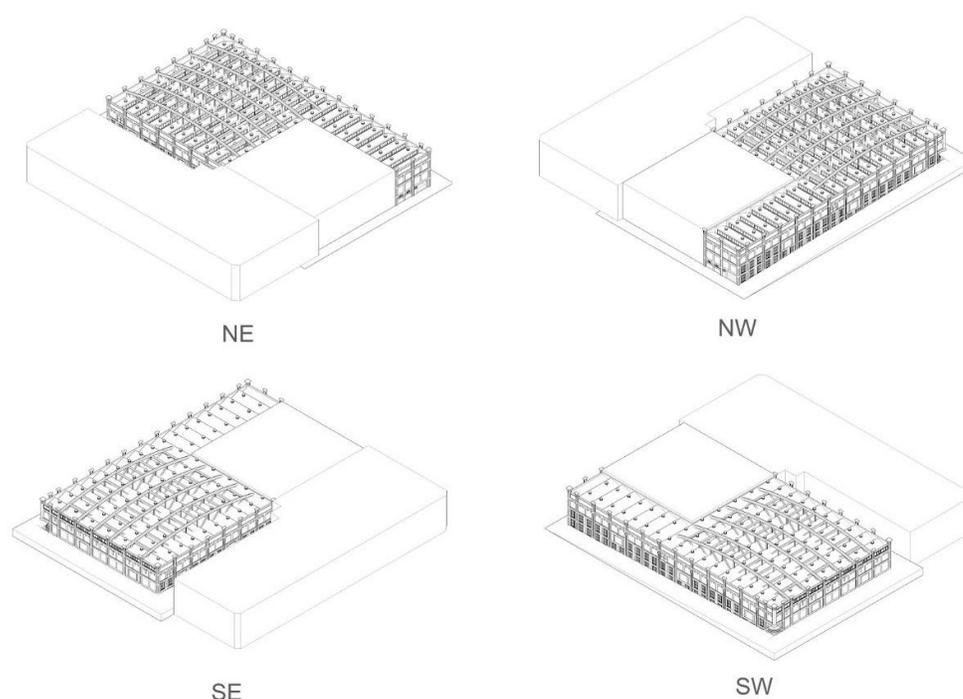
The various isometric views of the Bow Truss building: North east, north west, south east and south west.
